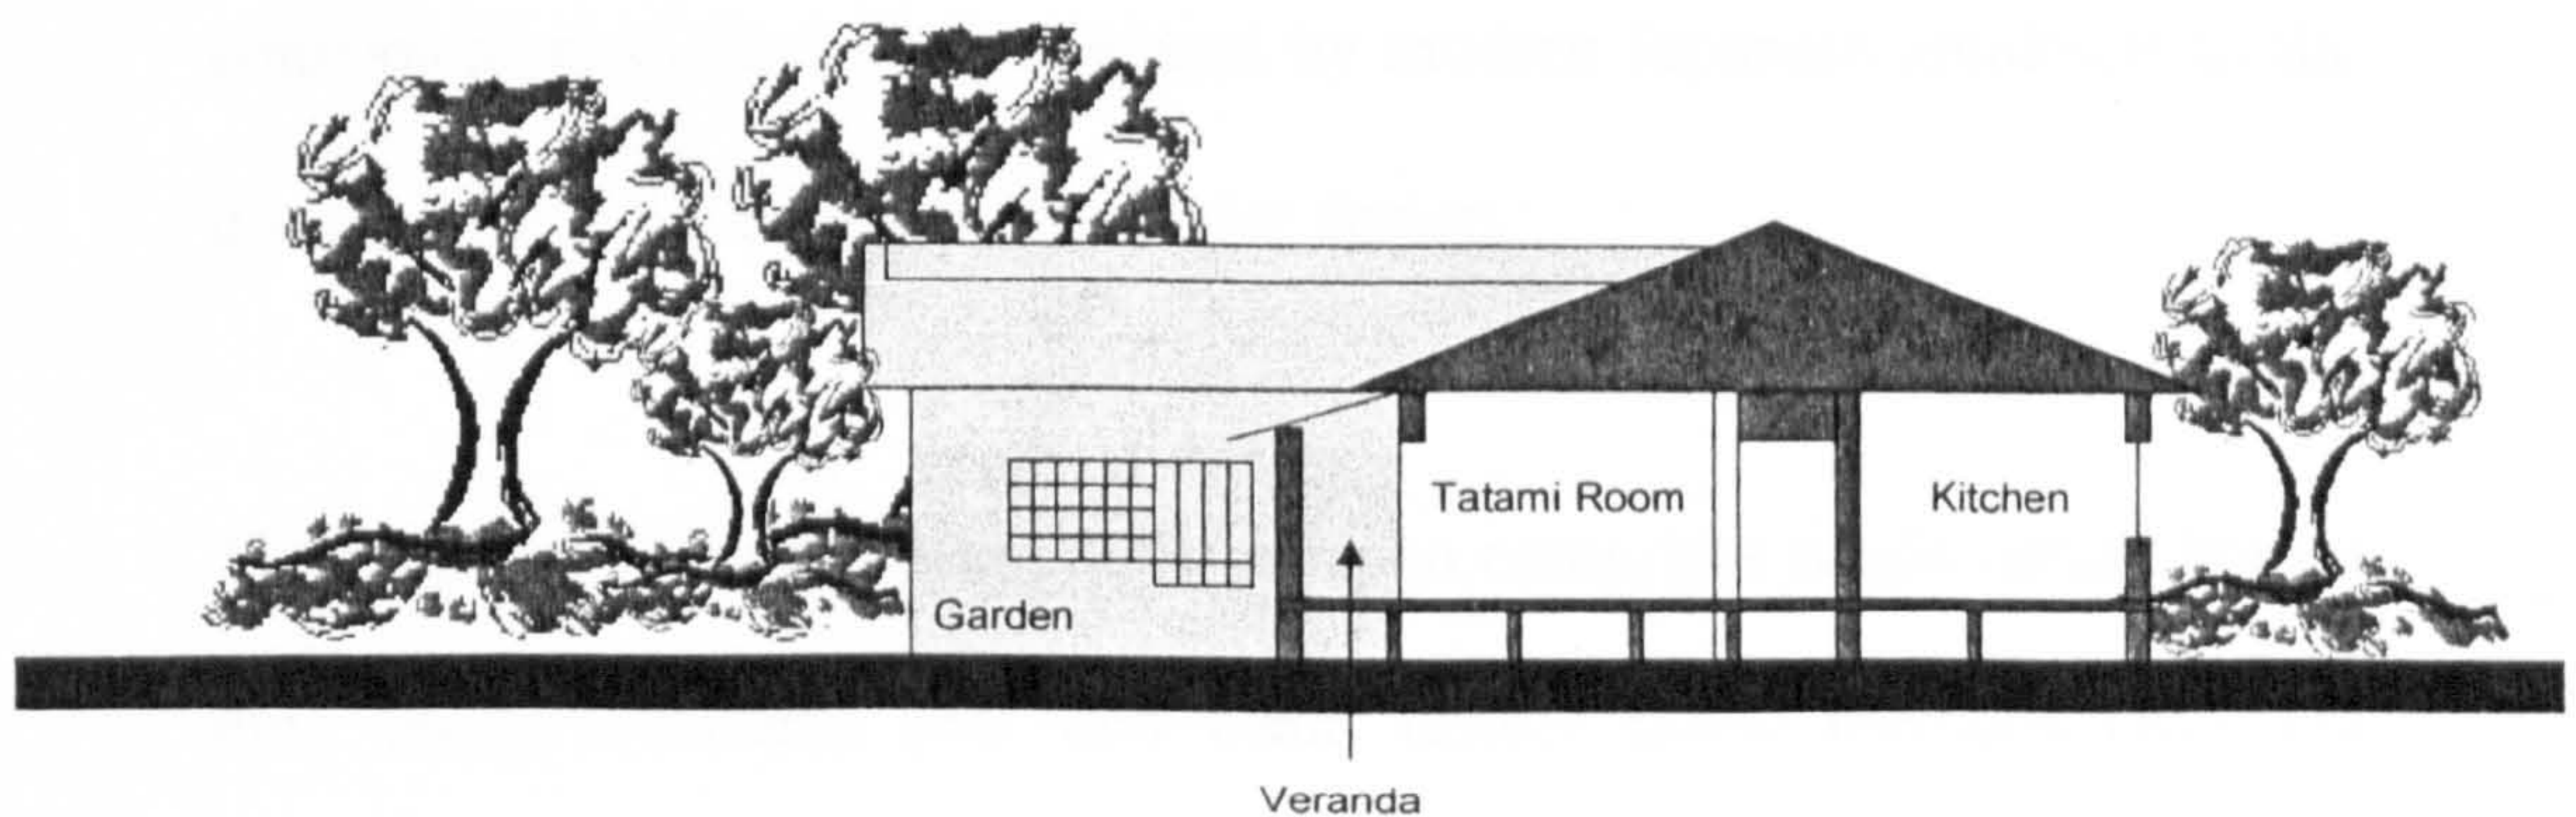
A typical cross-section of a traditional wooden Japanese house (Building Center of Japan 1998)
